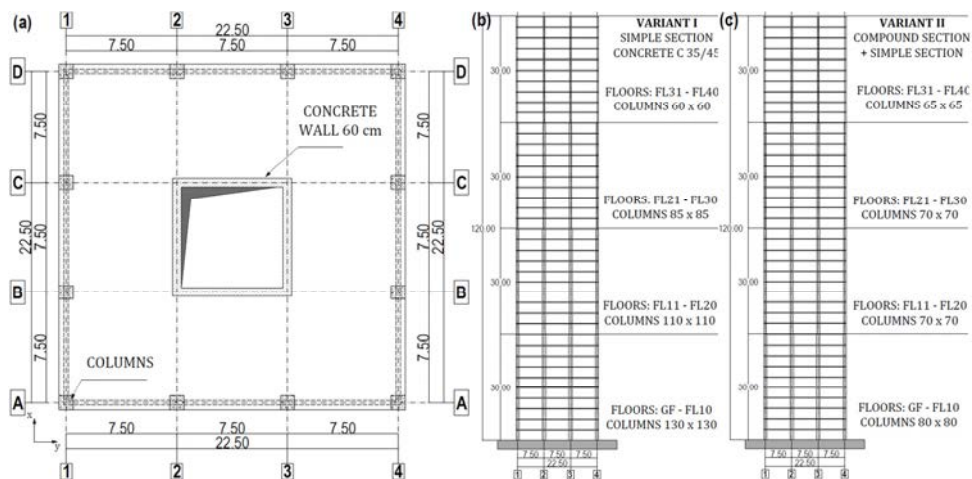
(a) Level layout; (b) Section in variant 1, (c) Section in variant 2
